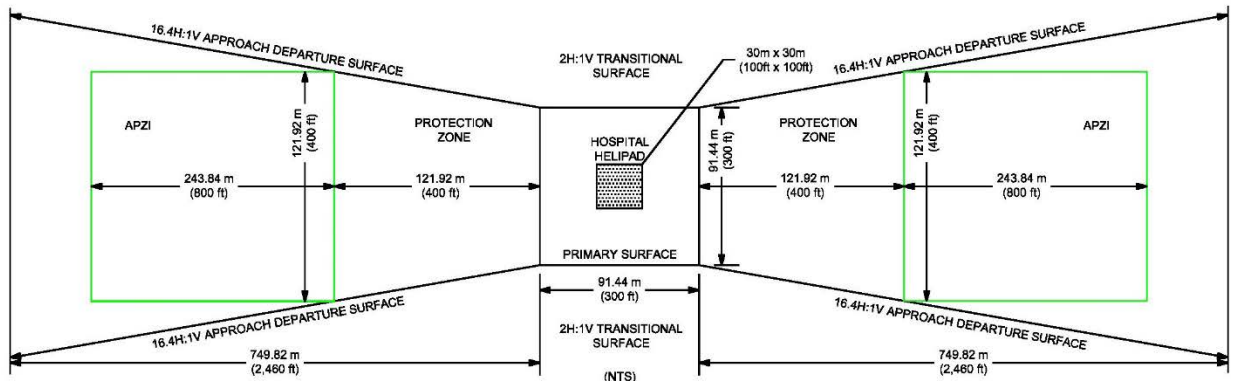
Elevated Hospital Helipad Layout Criteria for CH-47 and Larger Helicopters (16.4H:1V)
